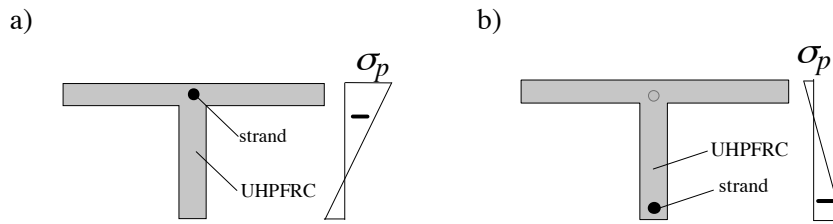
Position of prestressing strands in ribbed deck slab and distribution of prestressing stress, for the section subjected to: a) negative bending moment; b) positive bending moment
